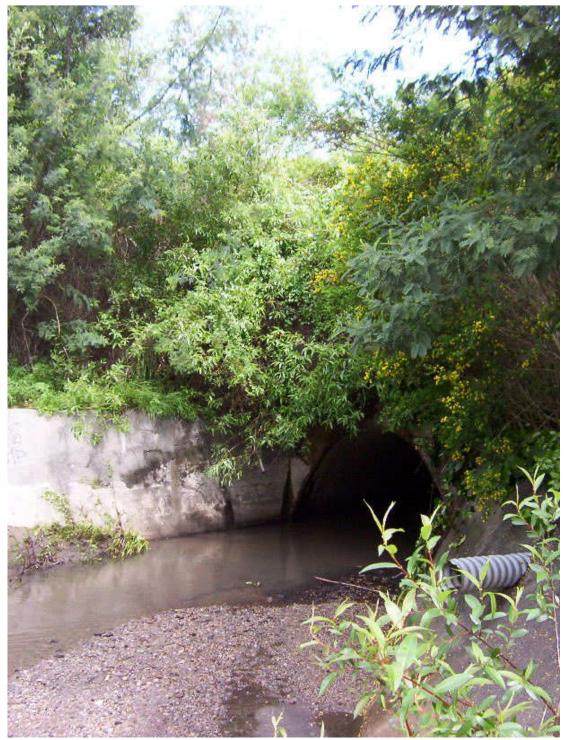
Arch culvert at Arana Gulch (Station 171+03) downstream of Highway 1 crossing
